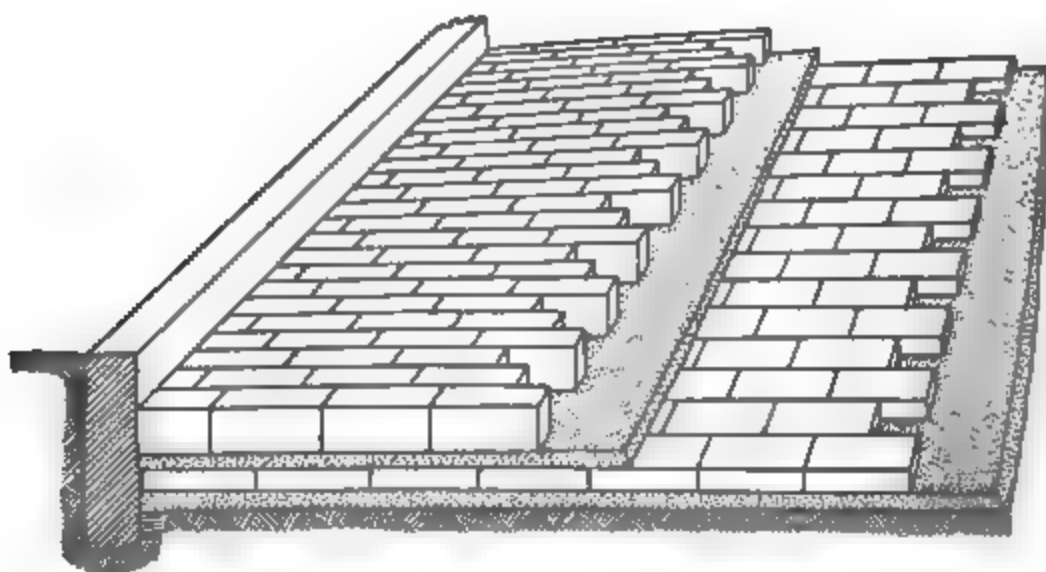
SECTION OF BRICK PAVEMENT WITH BRICK FOUNDATION.
